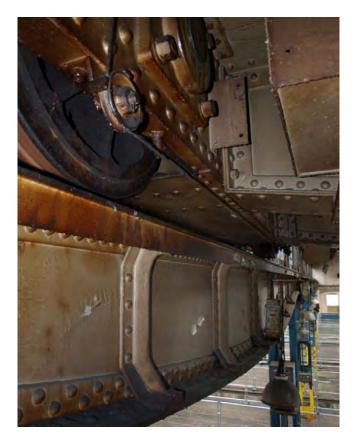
Detail of running wheel of Heywood crane on central 'fish belly' beam of Factory former Lifting Shop (15a)
